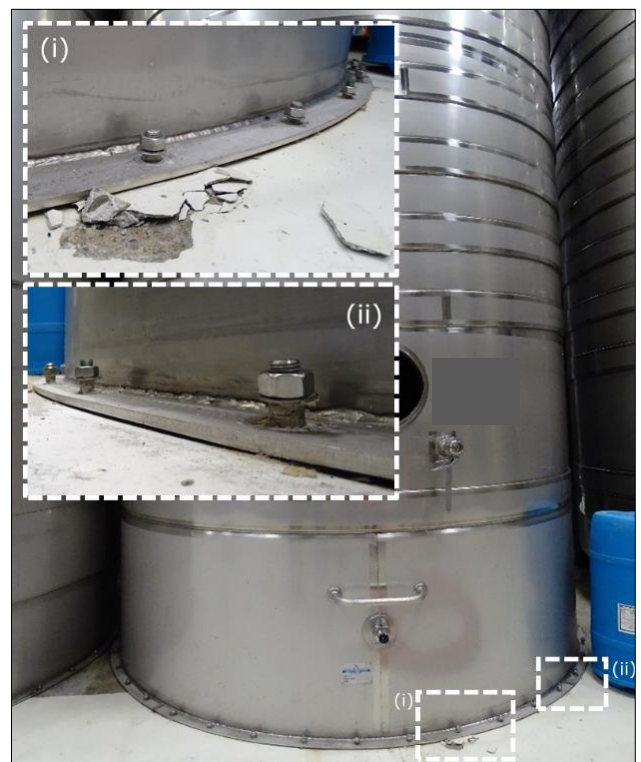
Damage observations to anchorage systems of flat-bedded stainless steel tanks.
